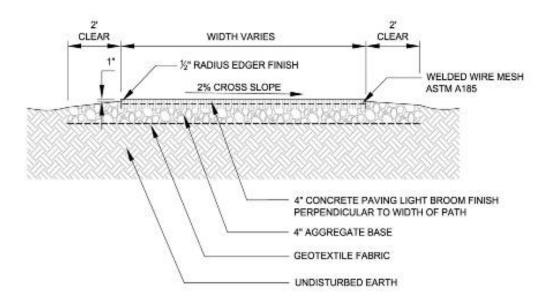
CONCRETE PATH CROSS-SECTION7
